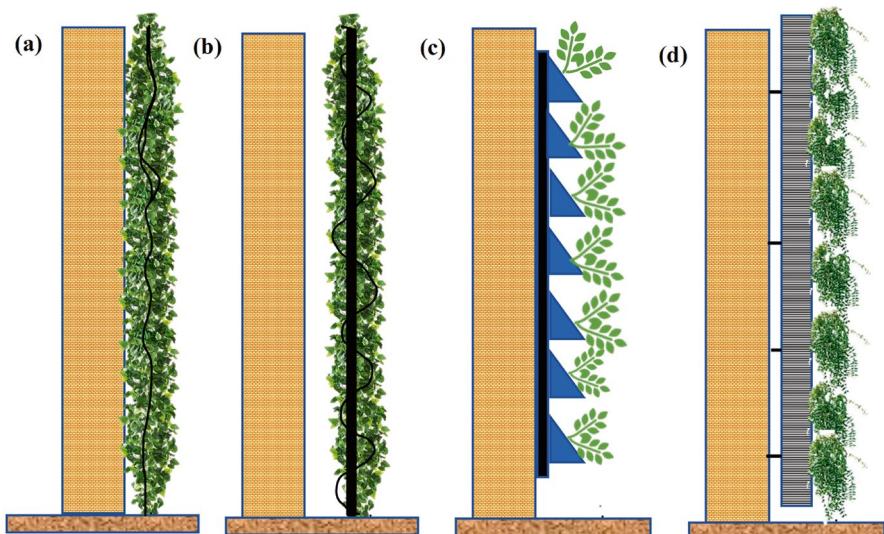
Schematics of green wall systems: (a) direct green façade (DGF); (b) indirect green façade (IGF); (c) modular living wall (MLW); (d) continuous living wall (CLW). (Source: Gholami et al., 2023)
